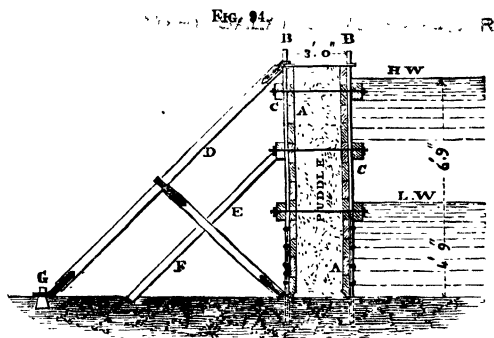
shows the principle on which this dam was constructed. It consisted of two rows, 3 feet apart, of Memel planks, A, A, 3 inches thick, placed horizontally and held in
